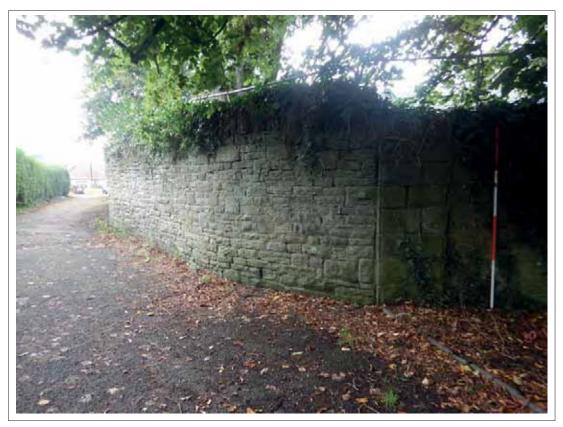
North-east corner of the curtilage wall, looking south. 2m scale.
